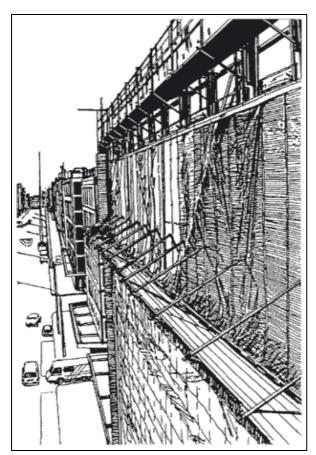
A single pole or putlog scaffold, with a single outer row of uprights or standards and which is partly supported by the building
